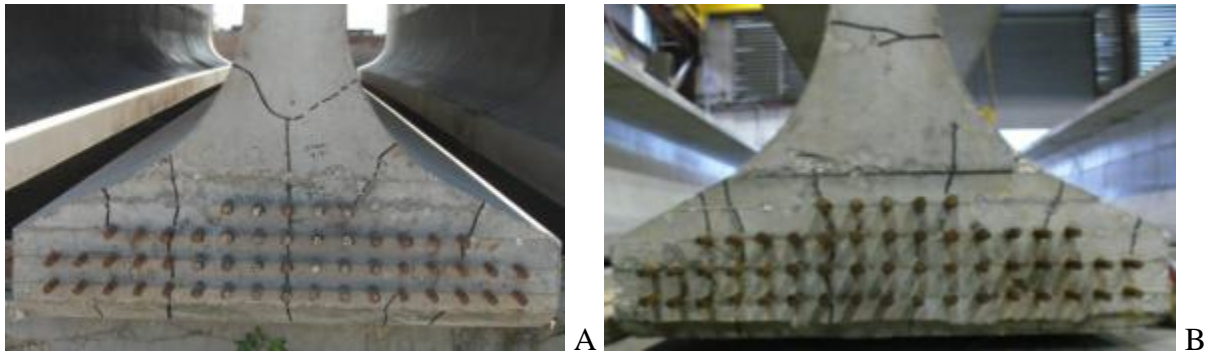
Girder F flange splitting cracks in A) specimen FN and B) specimen FB
